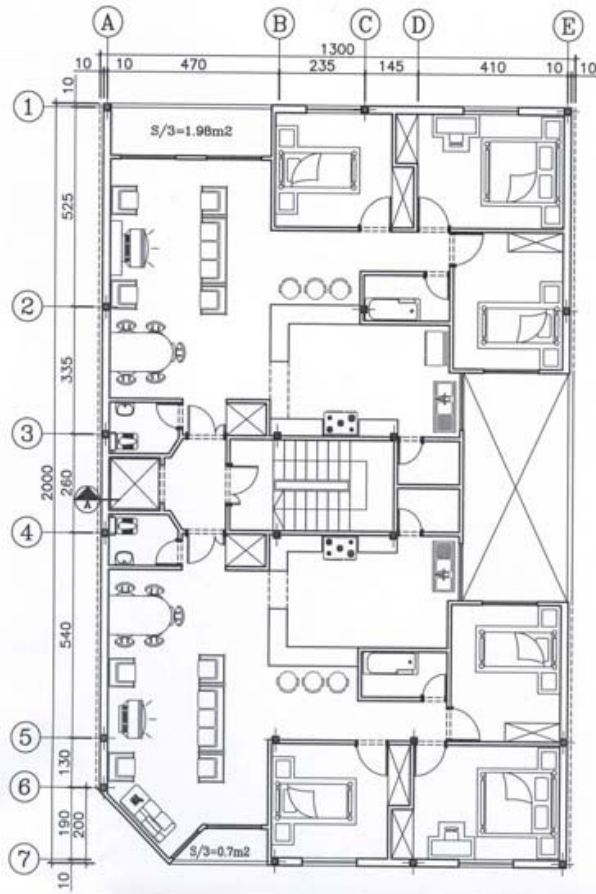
Plan of Residential building with Two Units in Each Storey, Isfahan.
